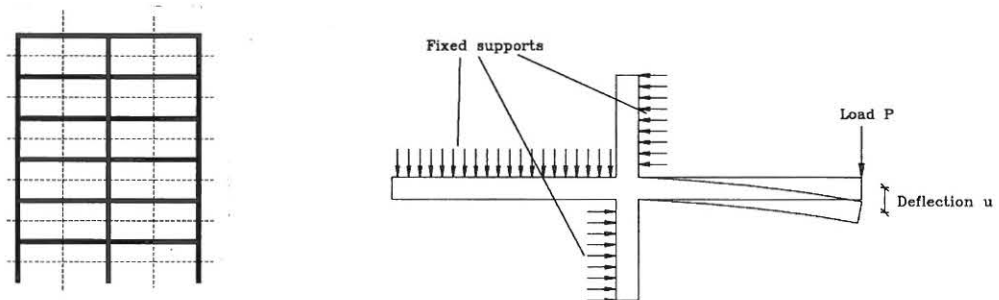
a) Separation lines. b) Schematic set-up of static testing of reference and damaged specimens.
